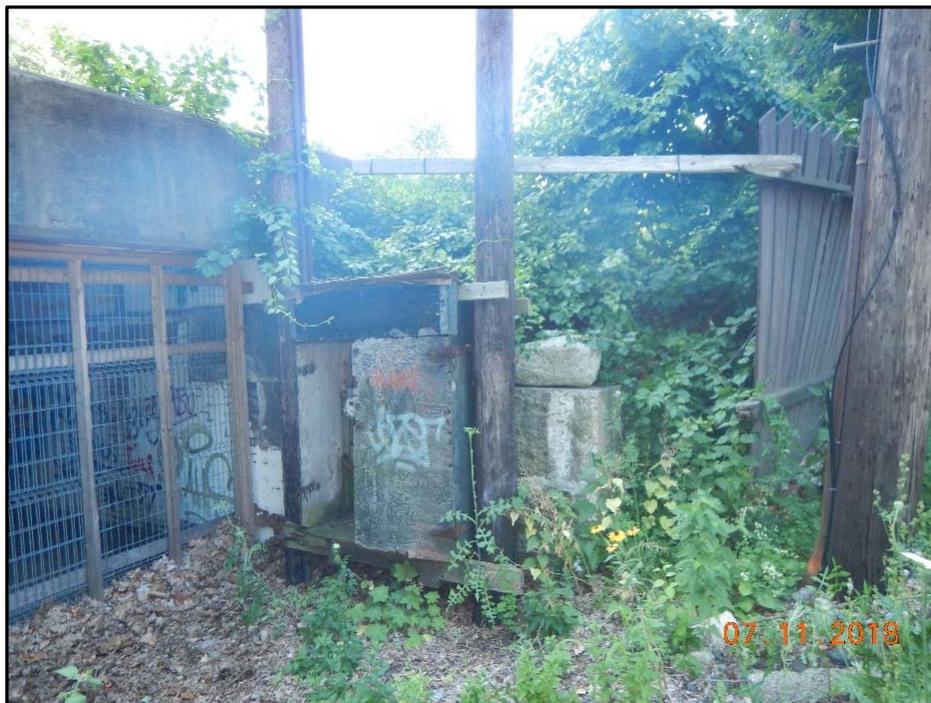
Southwest embankment – Heavy vegetation growth. Similar at northwest embankment.
